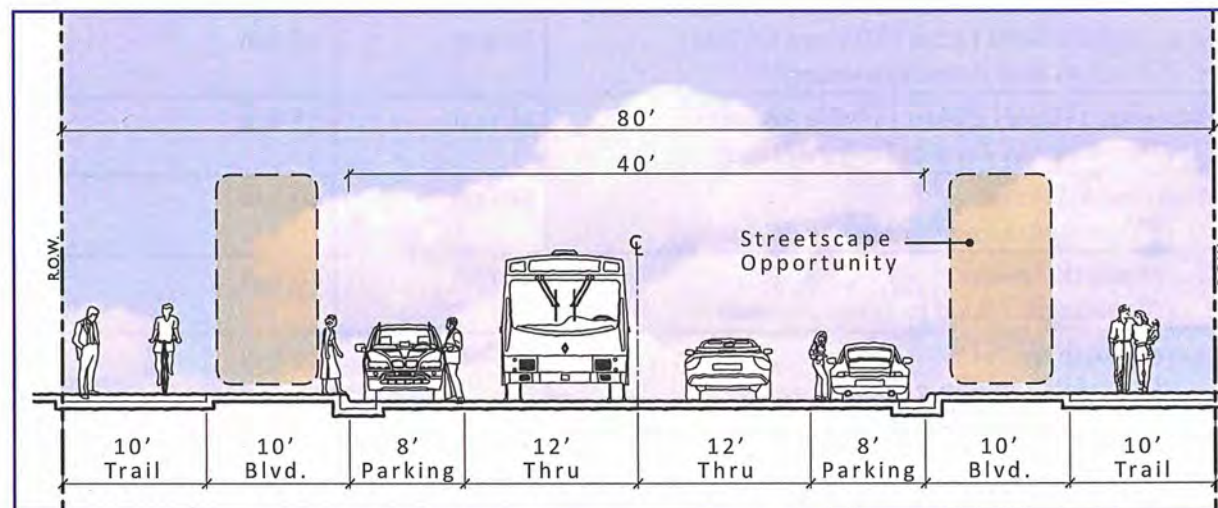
Leavenworth Avenue (Bloomington Road to Tower Avenue); Minnehaha Avenue (Bloomington Road to new LRT crossing)
